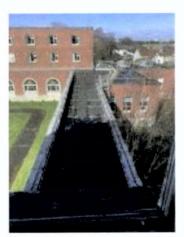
Roof of Building G, Link, as viewed from the rear extension of MPH
